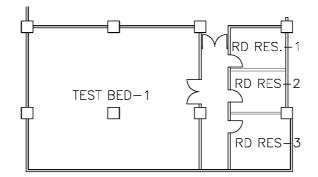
Office- Research/Incubator/ Test Bed/Incubator Floor Plan
